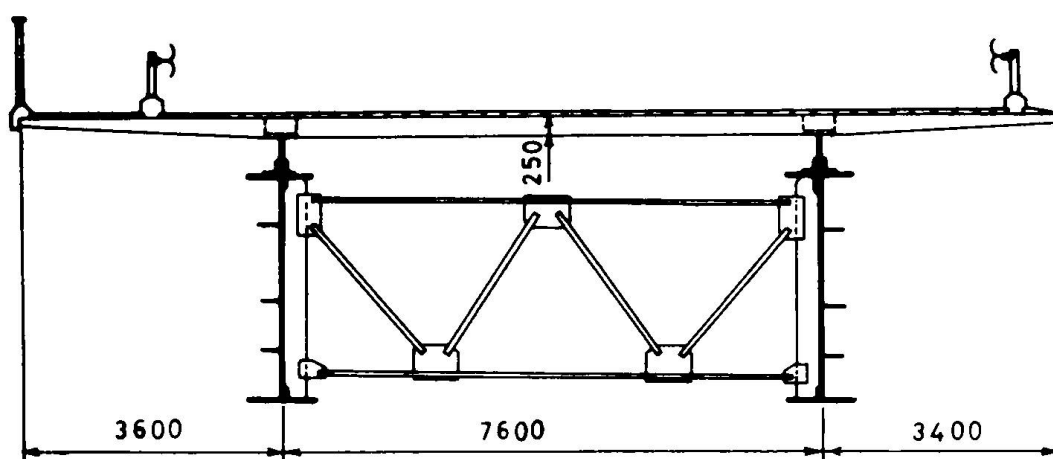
Typical cross section of superstructure using steel embeds for connection of steel to concrete.
